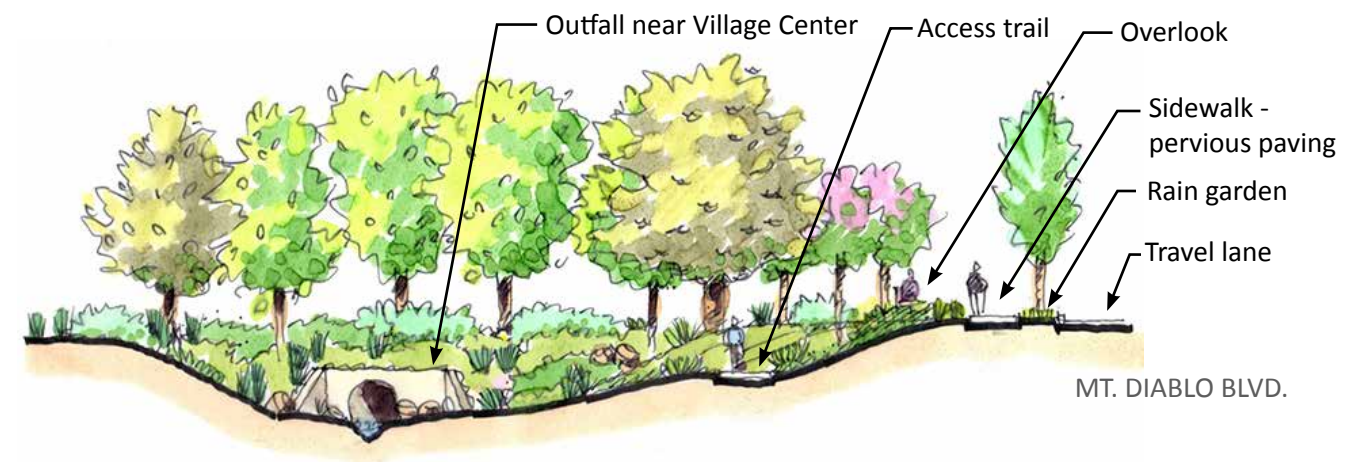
Section/elevation showing creek trail and overlook (N.T.S.)
